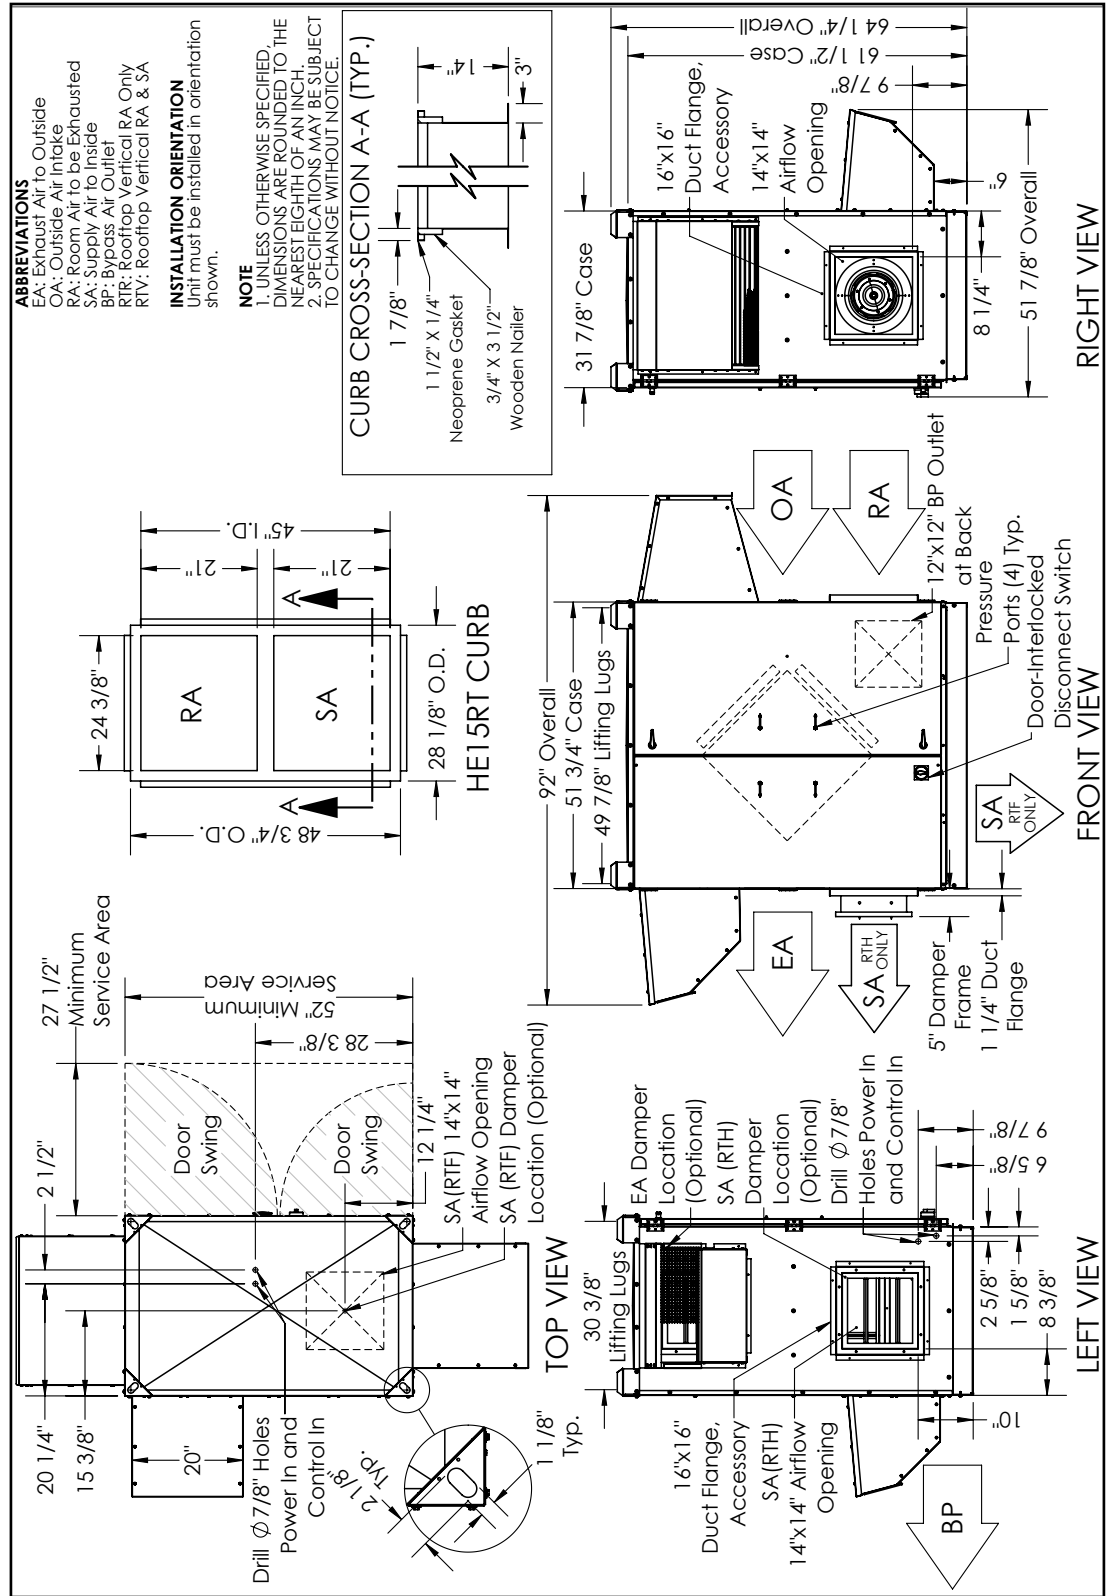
HE15RTF-H DIMENSION DRAWING
